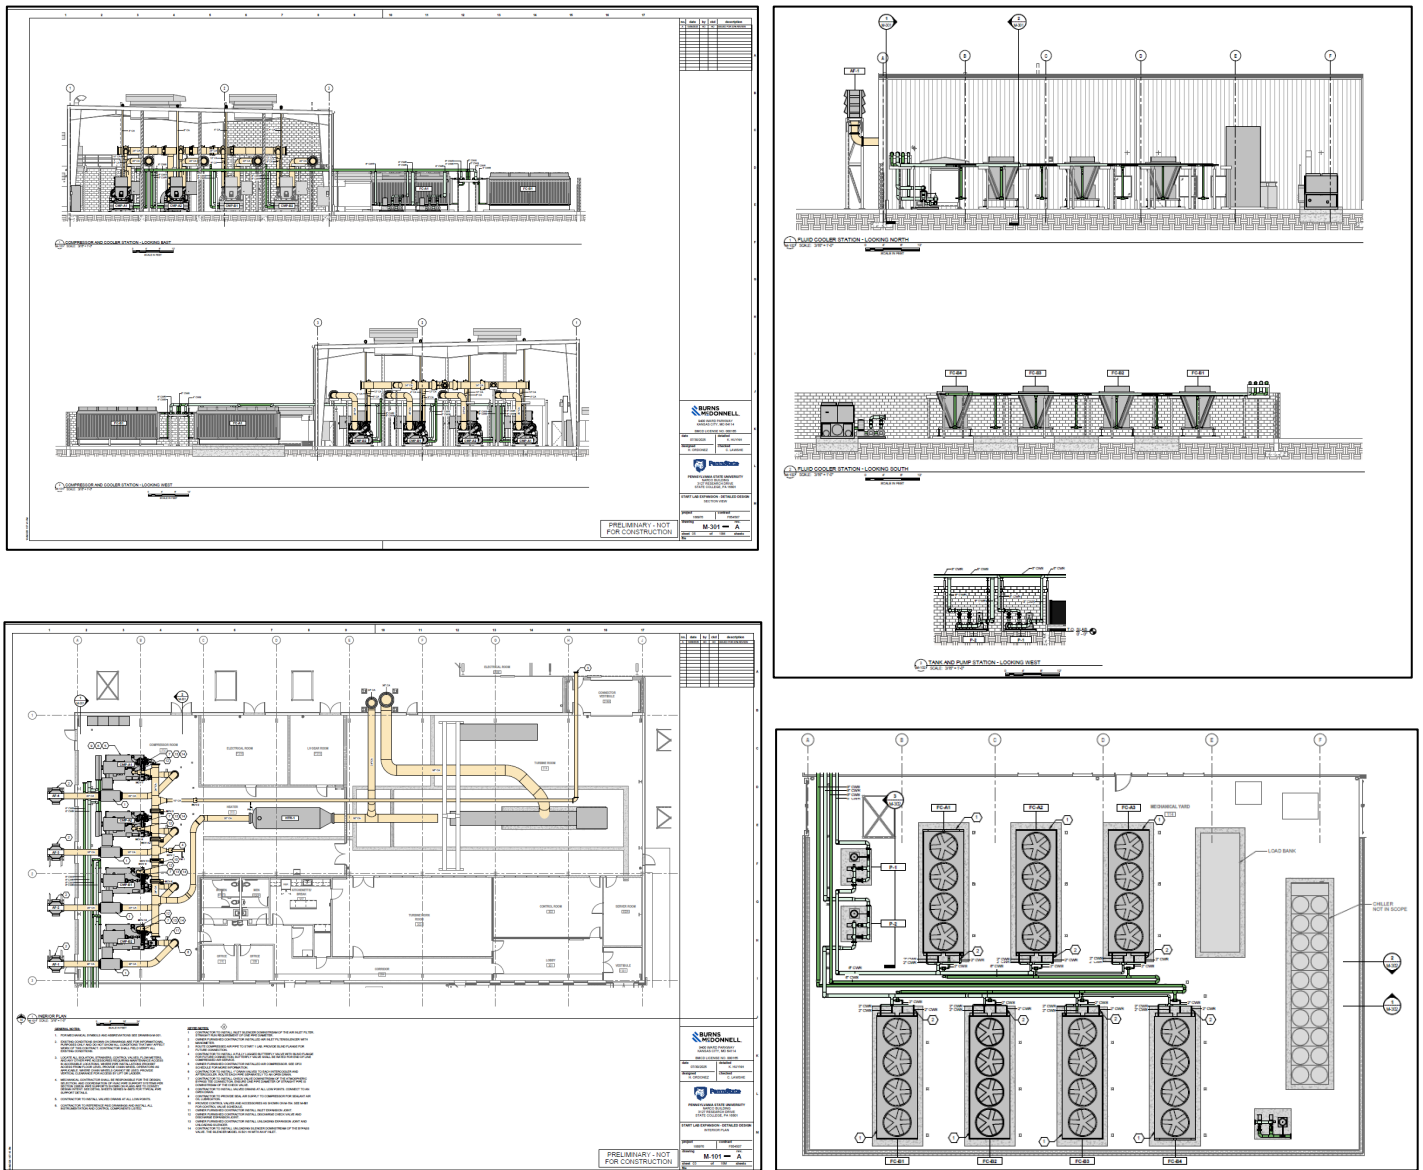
Drawing examples of the detailed design work for the major equipment system integration.
